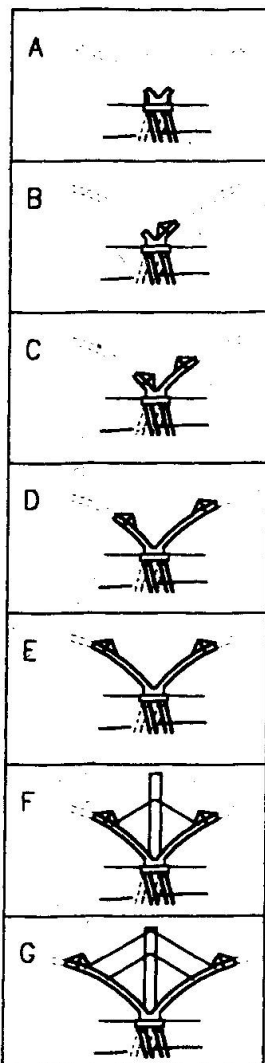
TYPICAL CANTILEVER CONSTRUCTION SEQUENCE FOR ARCH USING STAY
